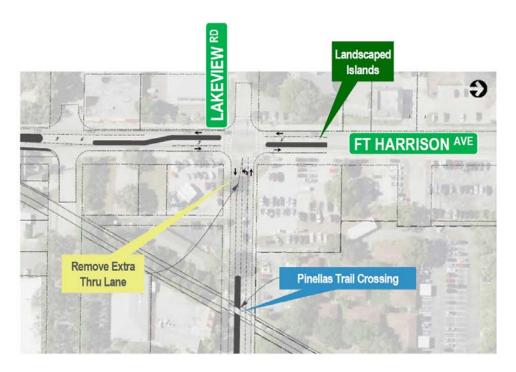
Concept Plan Reconfigured Lakeview Road Intersection
